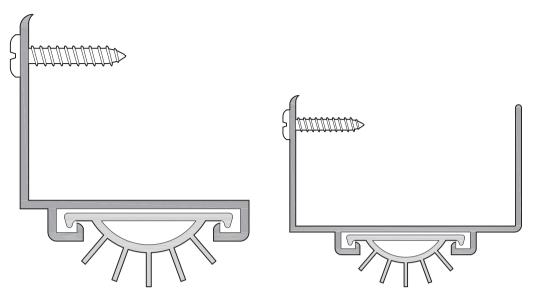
Surface-Mounted Half-Door Shoe (Source: Courtesy of Pemko Manufacturing Company)
